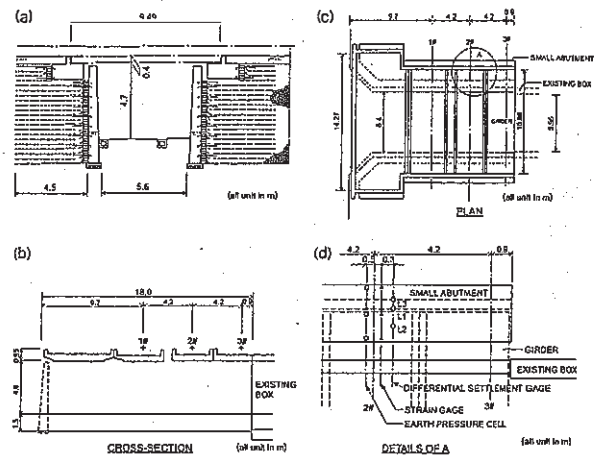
Bridge abutments at Hibitsu, Nagoya; (a) front view, (b) cross-section, (c) plan and (d) close view of zone A in (c)
